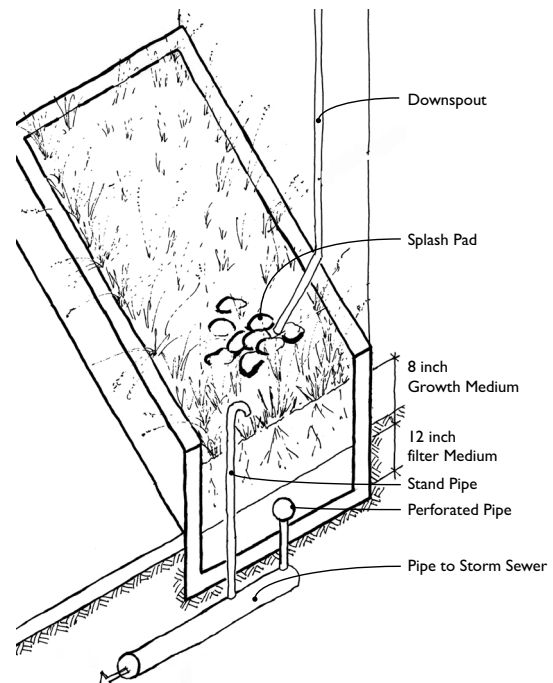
A.2: Raised planters can be used to provide benefits similar to swales.
